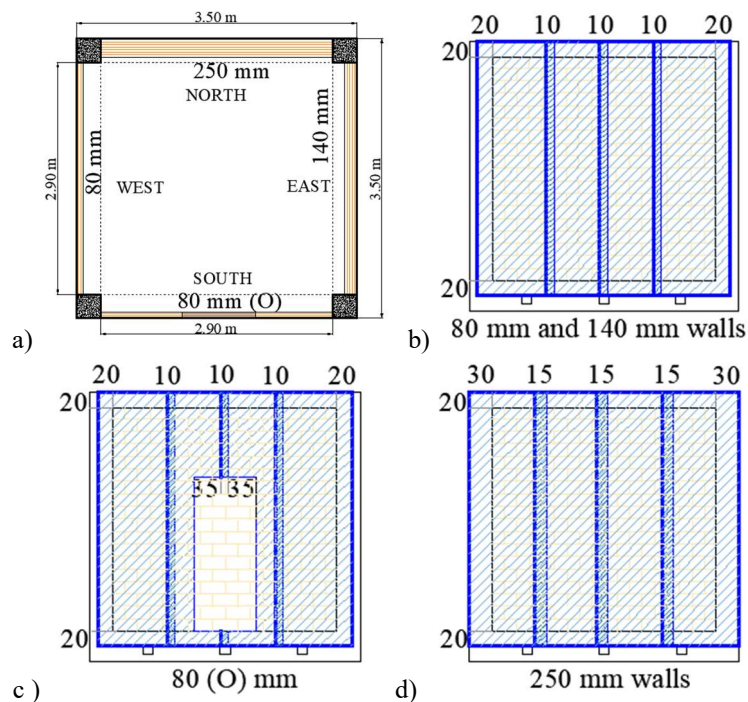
a) Specimen plan view. Retrofitting b) East and West sides c) South side d) North side.
